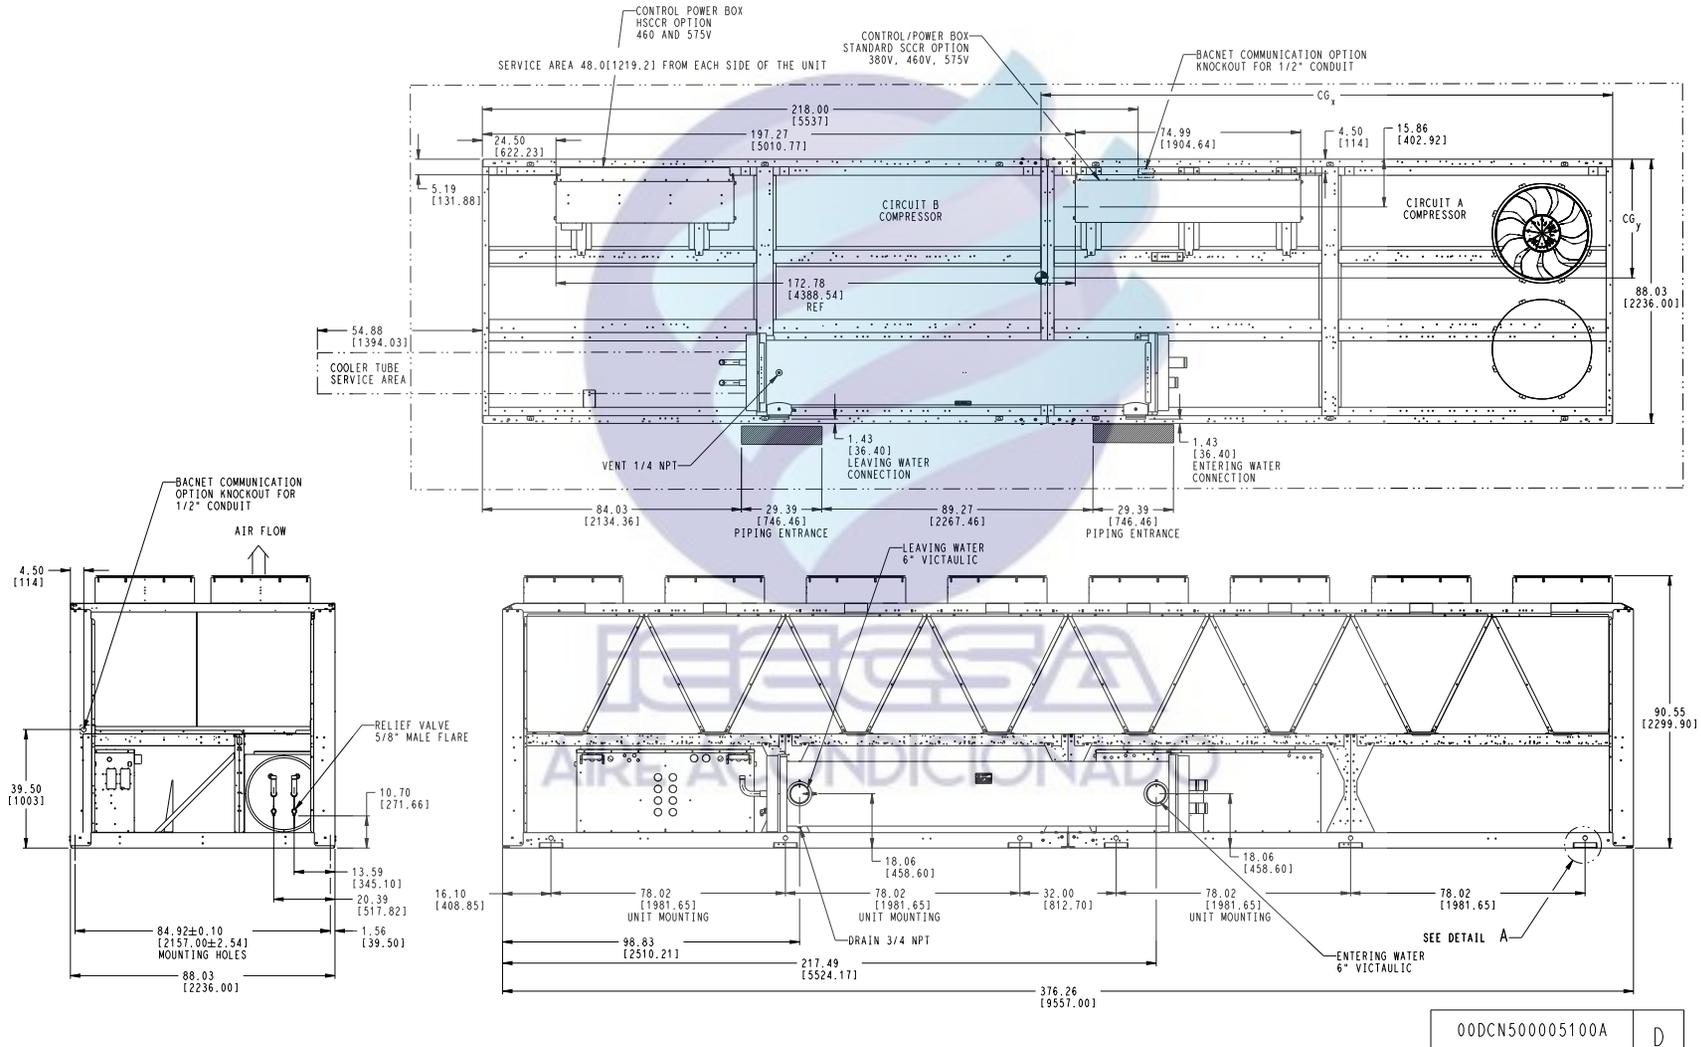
30XA302 Air-Cooled Liquid Chiller Dimensions
